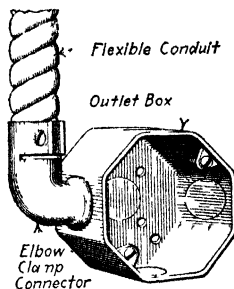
Elbow-clamp connection between flexible conduit and an outlet box
